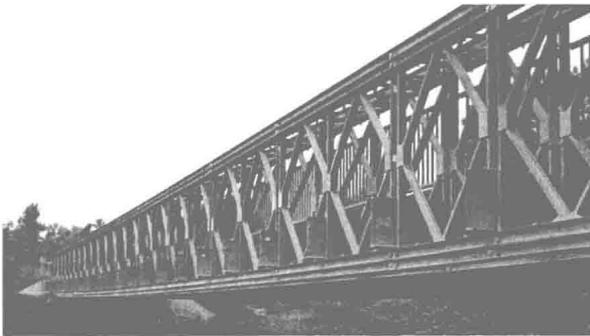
Monitored bridge construction MABEY UNIVERSAL
